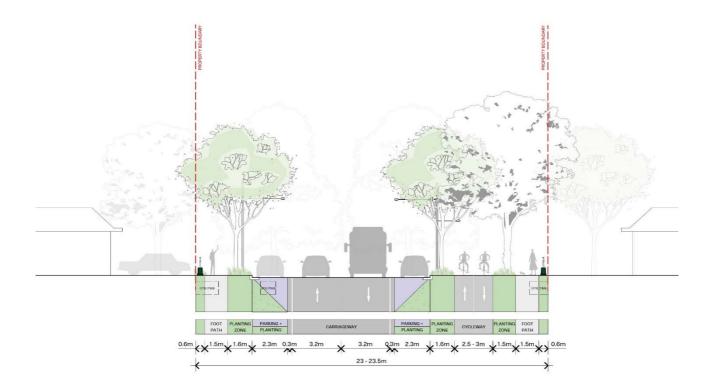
Connector Street cross-section (1:200 @A4 scale)
